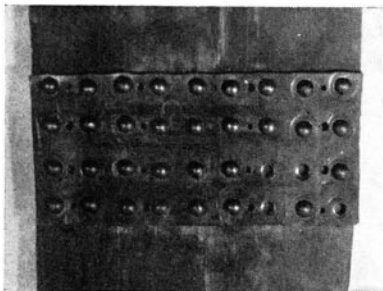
(LEFT). FAILURE BY RIVET SHEAR;
